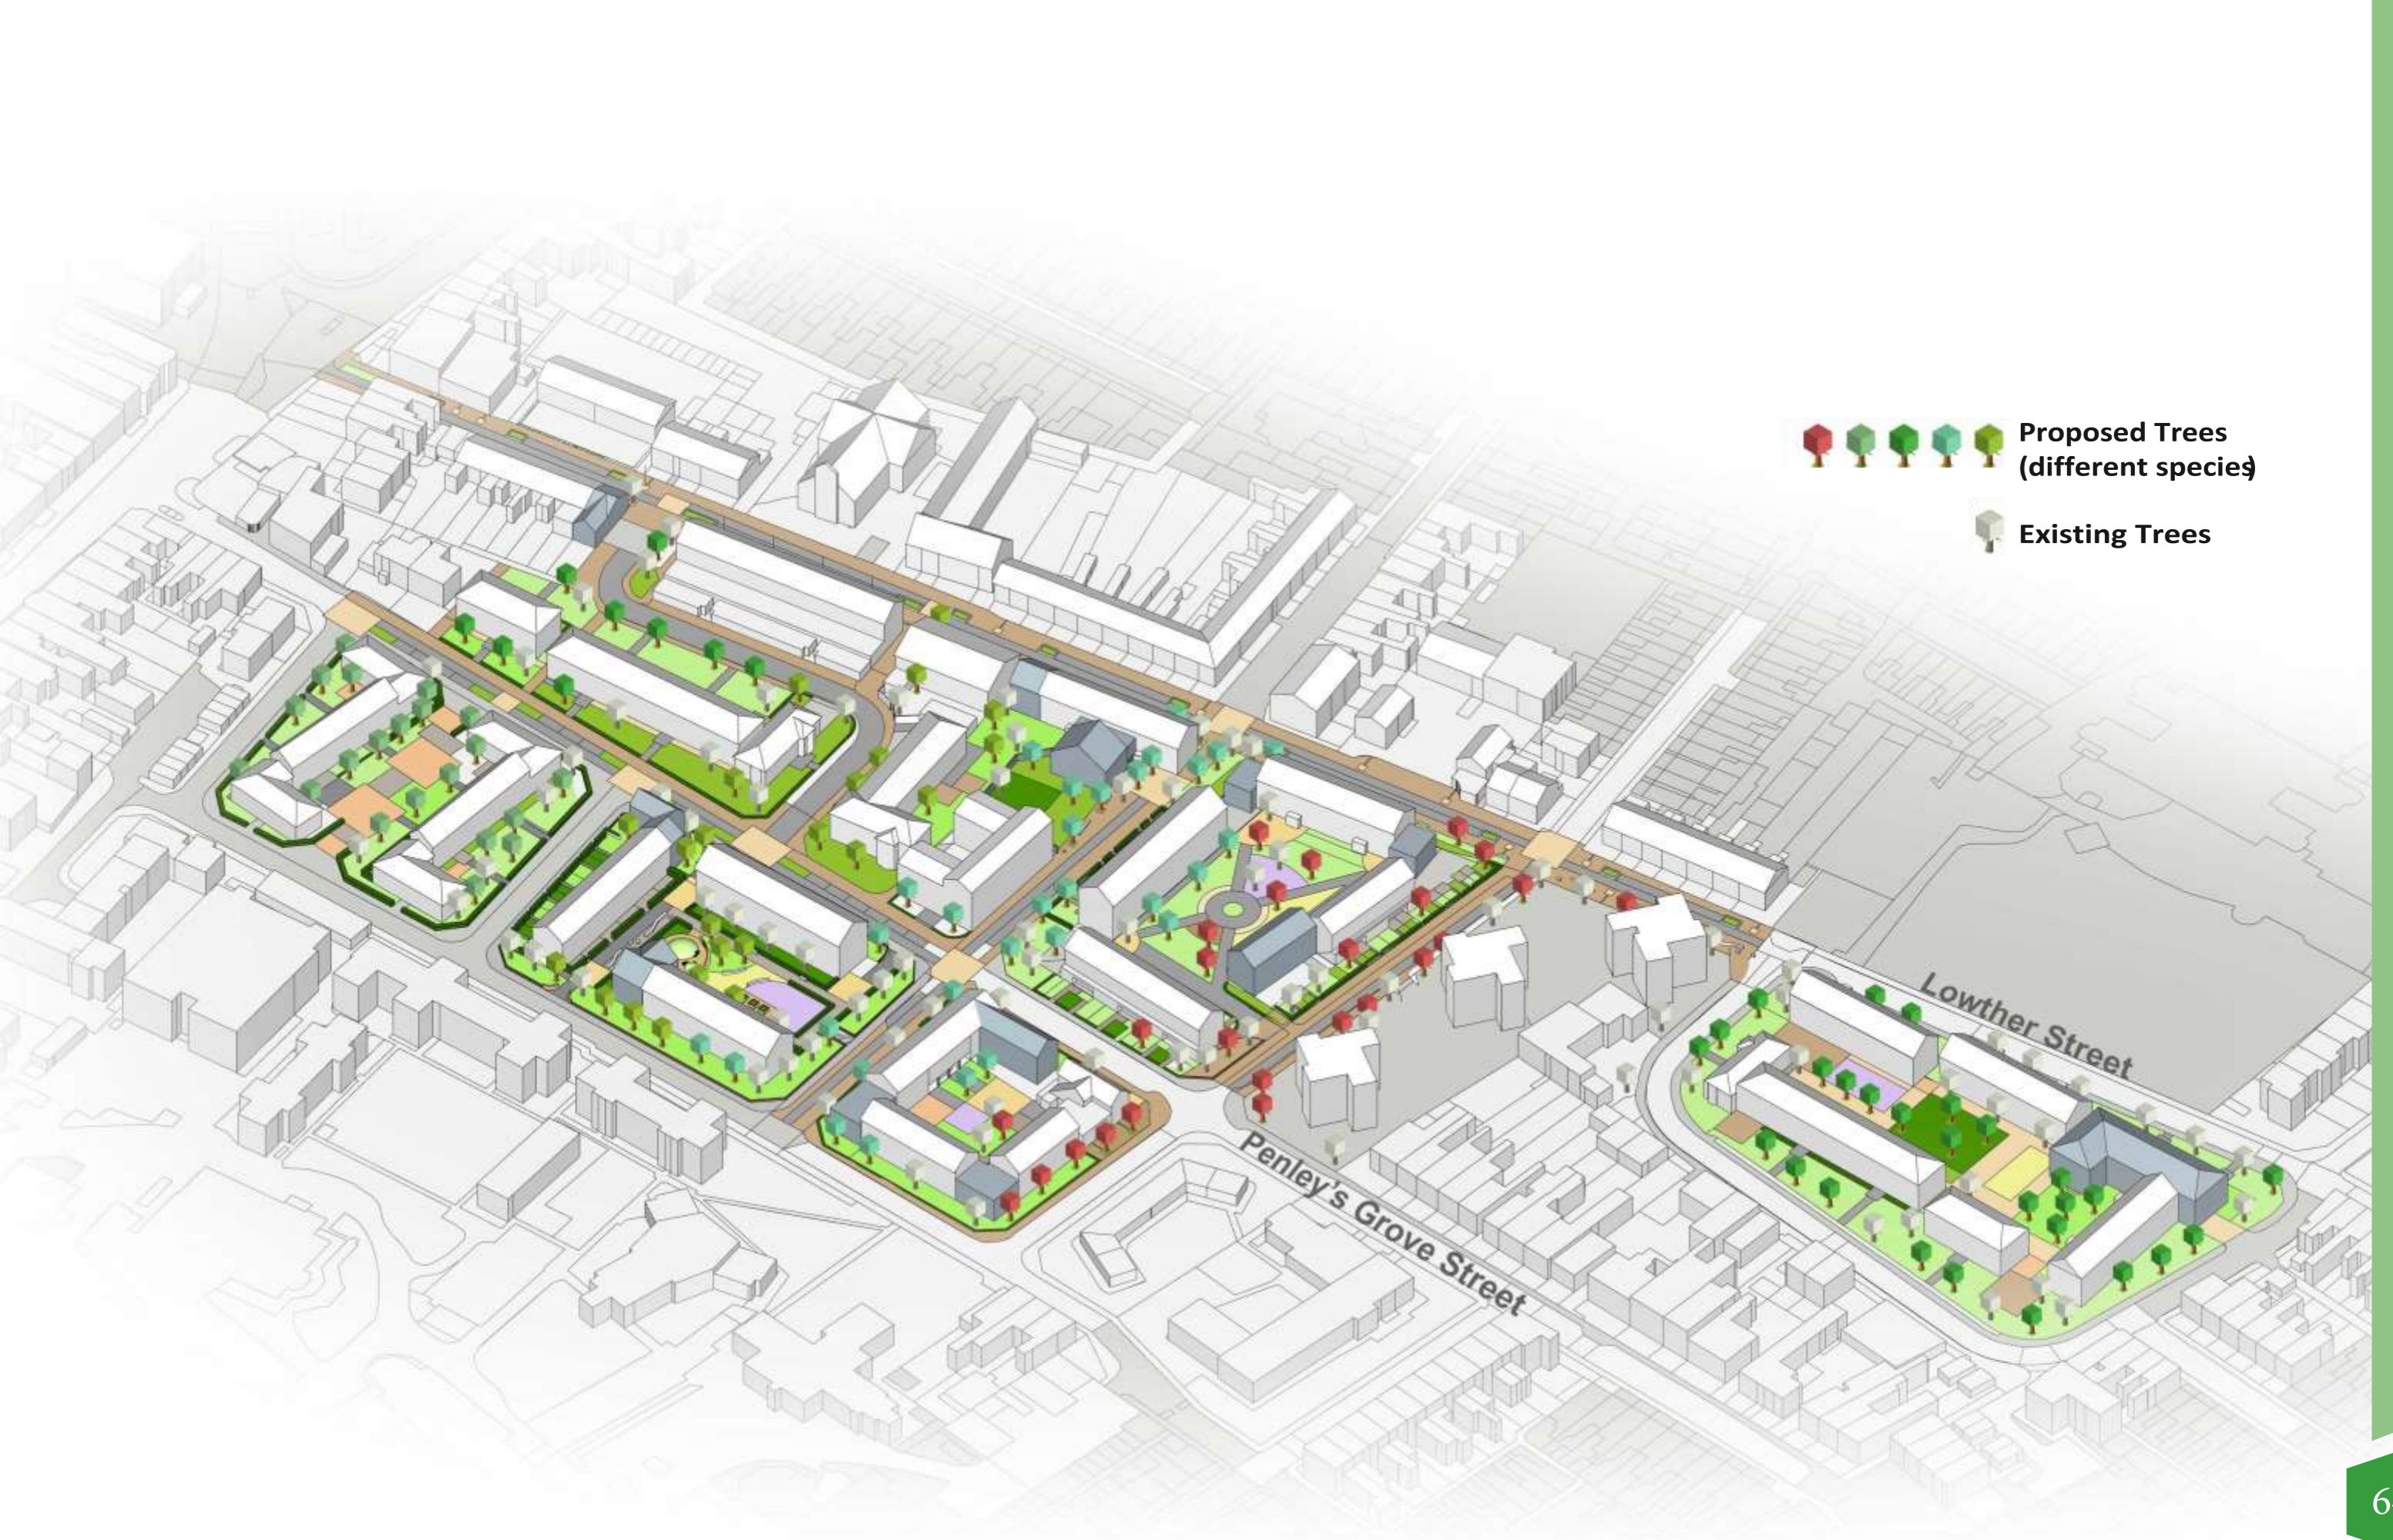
Aerial view of new street tree planting to aid wayfinding
